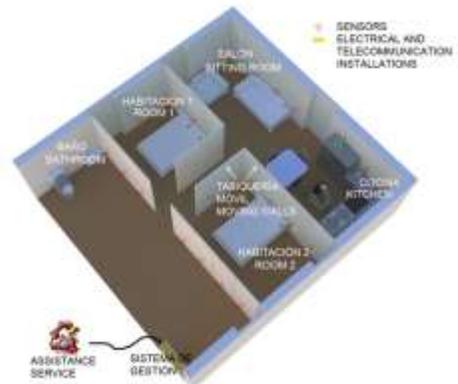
Home with two bedrooms + living room + bathroom + kitchen
